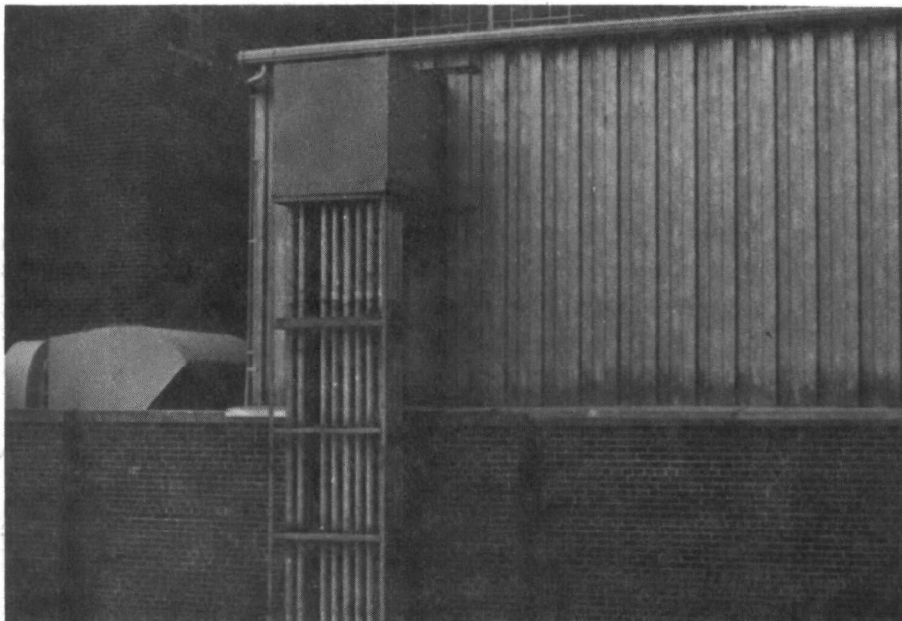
View of scrubber switchgear building showing conduit run for FGD system power supply.
